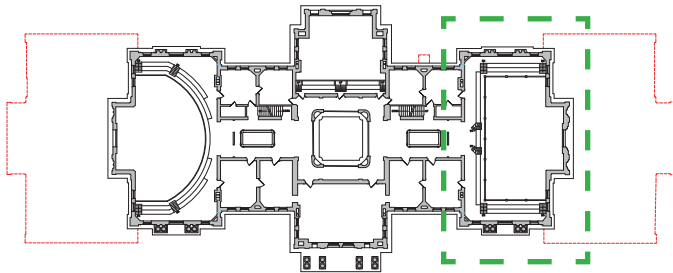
Phase II [1890] Third Floor Plan, Highlighting the House Chamber Illustrated in Figure 4.49.
